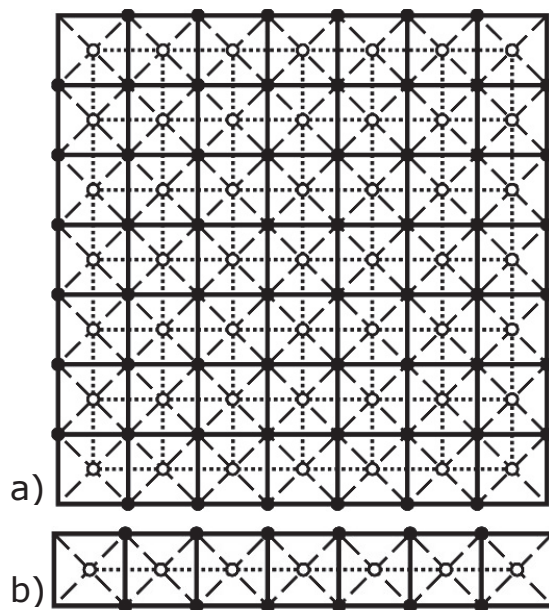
The steel and concrete composite cable space frame assembled as a surface (a) and a slab (b)
